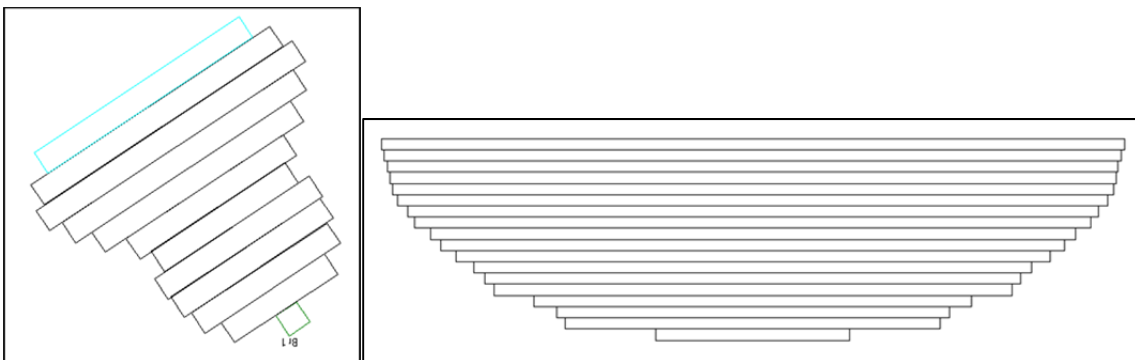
Plan View of Model Grid (Left) and Section View of Segment 12 (Right)
